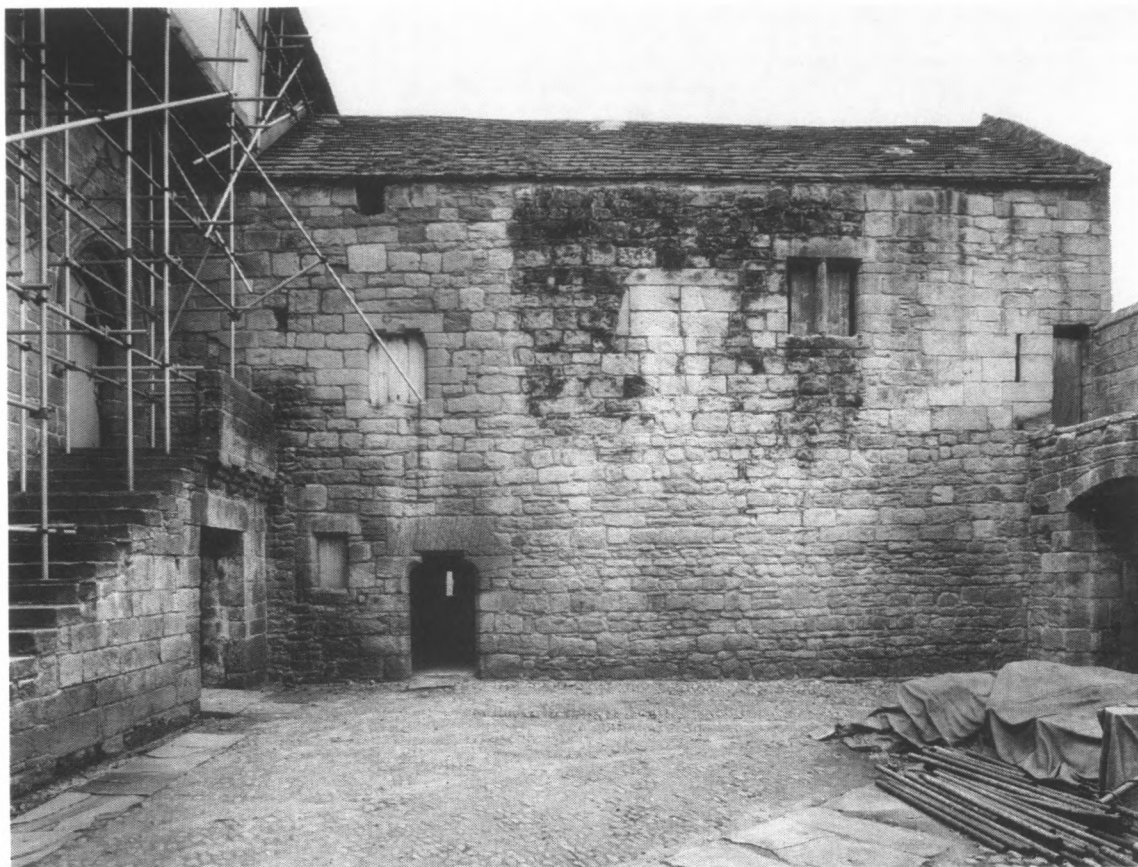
East elevation of kitchen range during conservation work in 1967.
